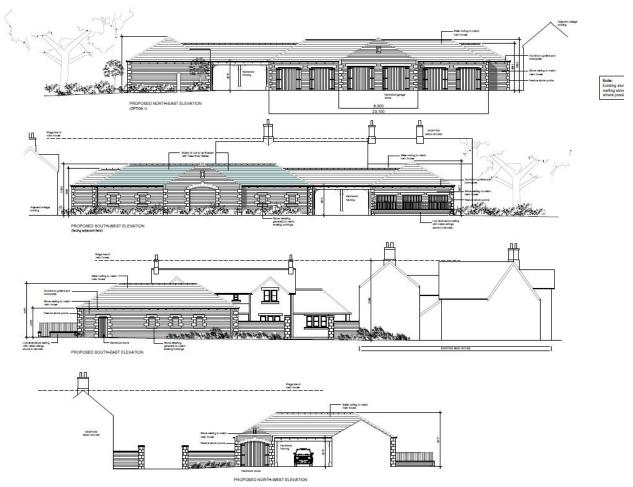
Proposed elevations of new outbuildings in context with Evistones House and proposed dwelling. Solar roof slates highlighted in blue.
